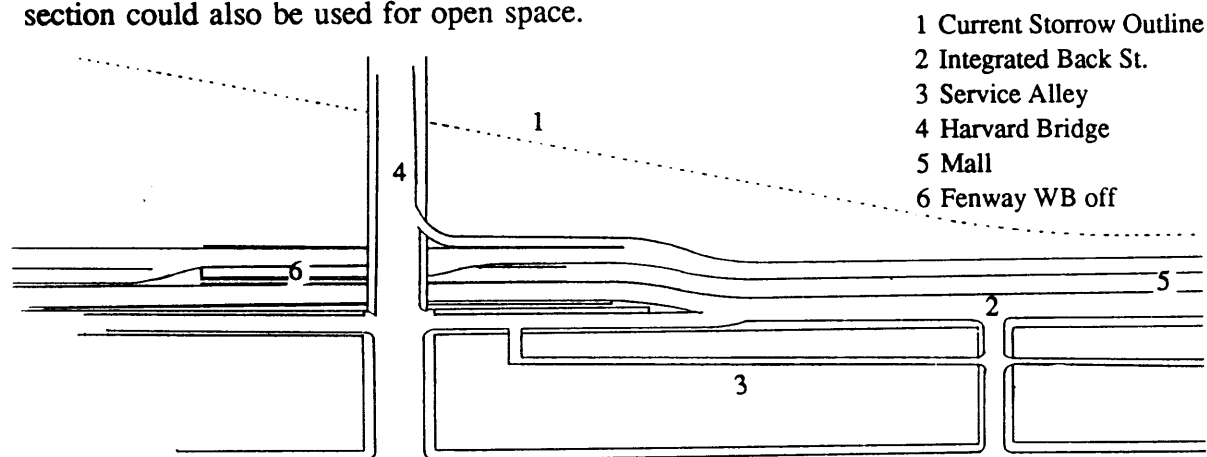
Redesign Option for Harvard Bridge Underpass and Integrated Back Street.
